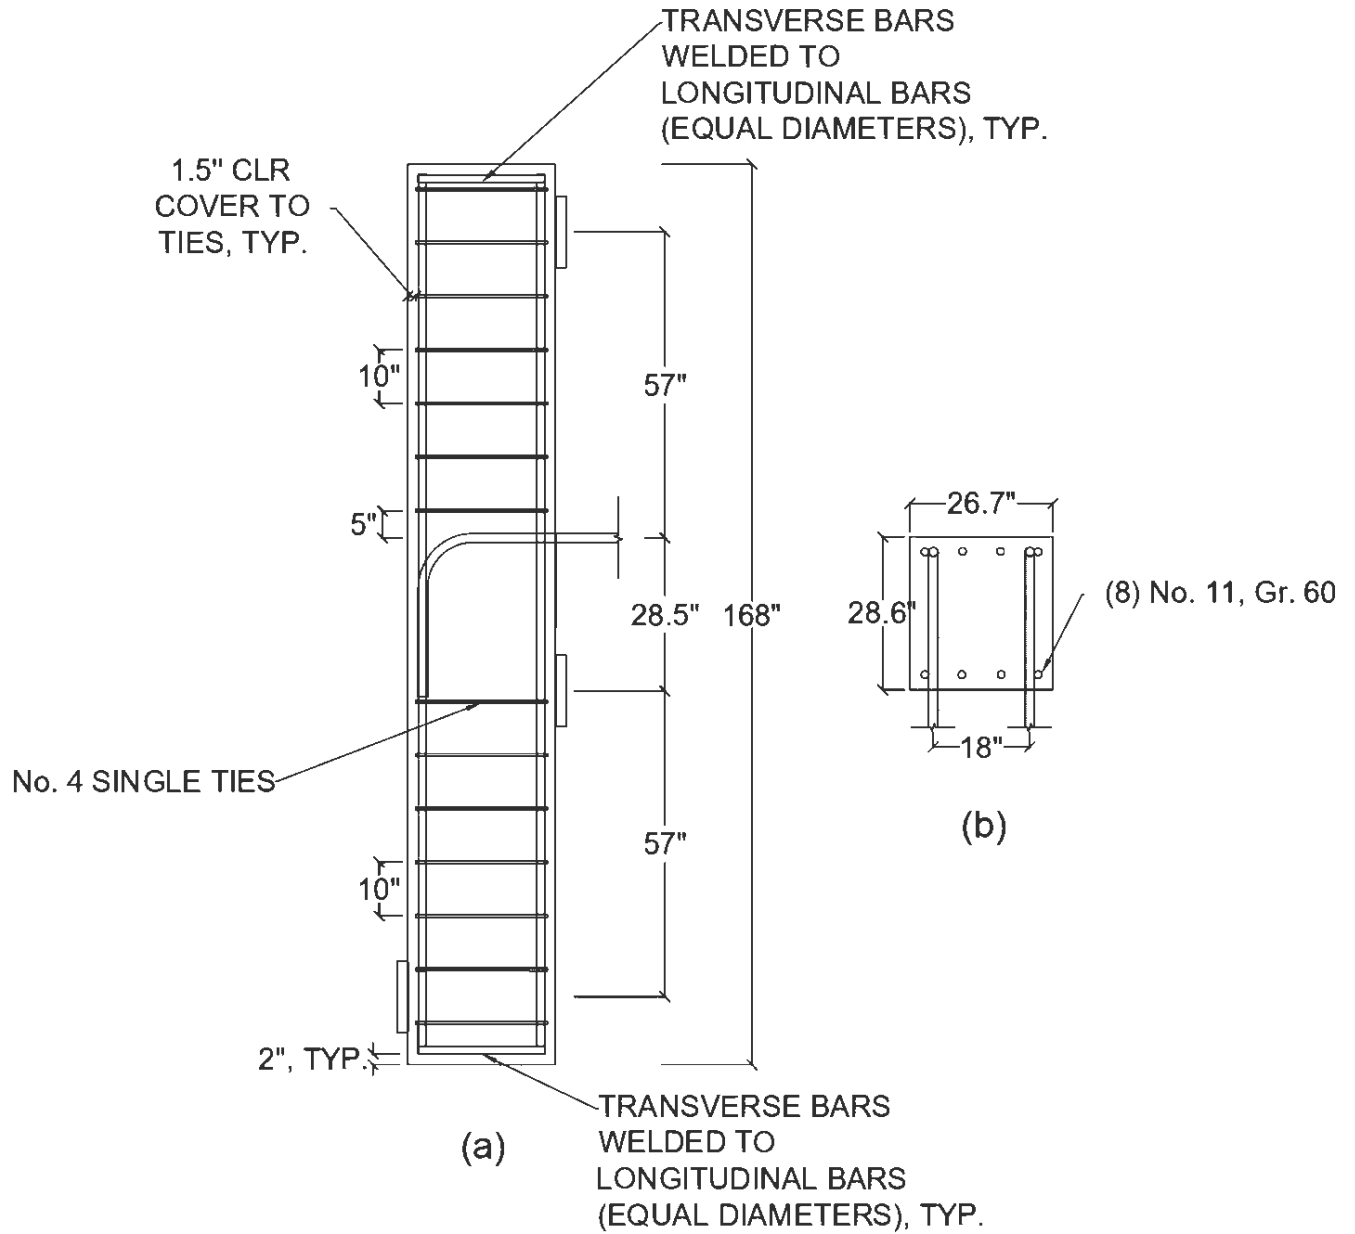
Details of reinforcement layout for No. 14 hooked bar specimen H14-15: (a) elevation, (b) cross-section
